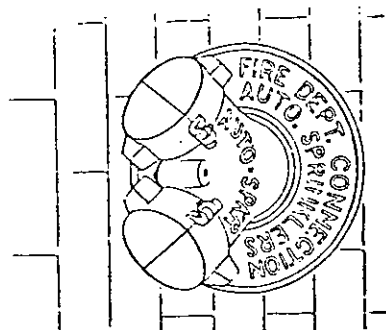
(a). Typical fire department connection to automatic sprinkler systems mounted on building wall showing 2 1/2-inch intakes which would be supplied by lines from one of the first responding pumpers.
